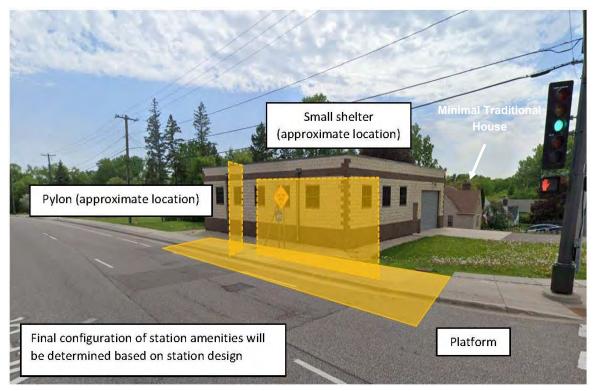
Rice Street and County Road B northbound platform.in area of Minimal Traditional House.
